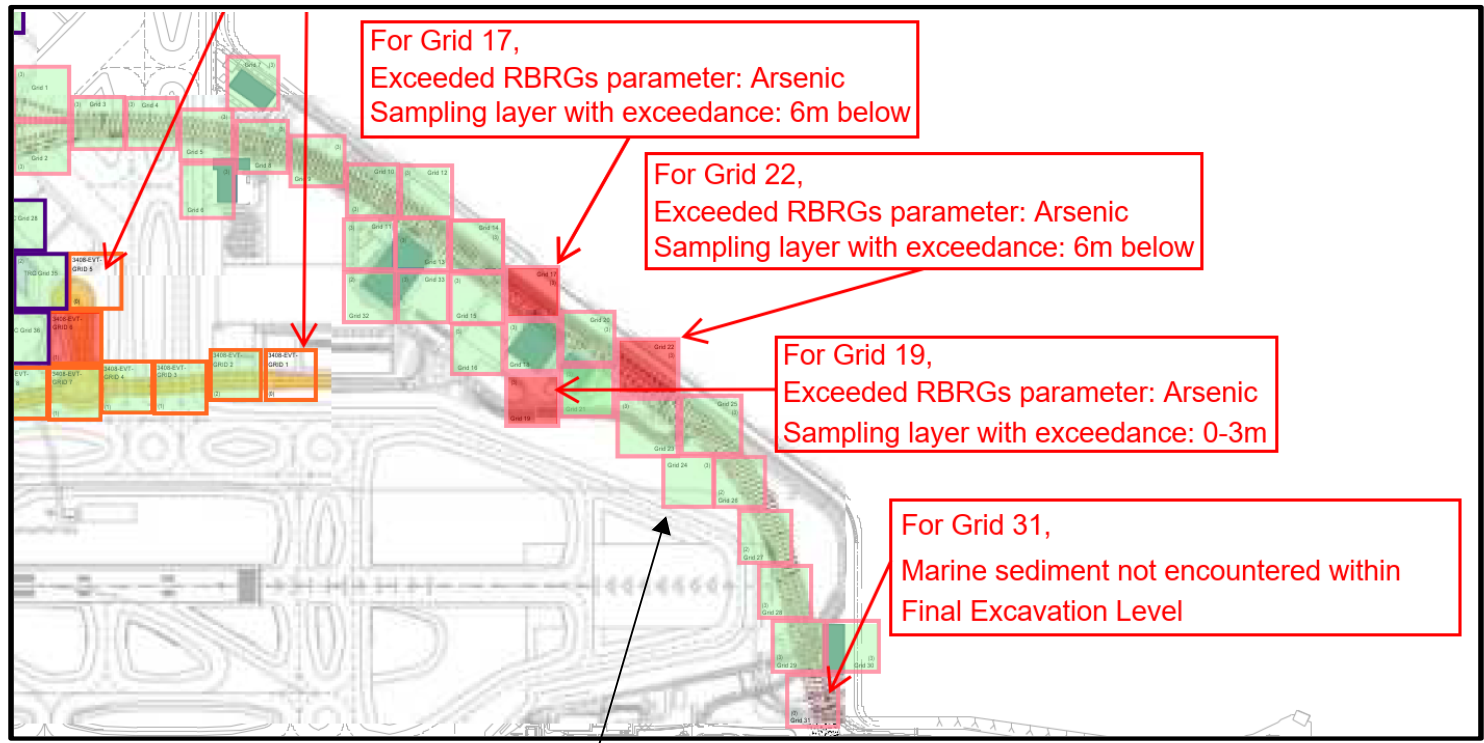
Zoom in Layout of Sampling Grid for APM/BHS Tunnel and Ancillary Building with Piled Foundation
